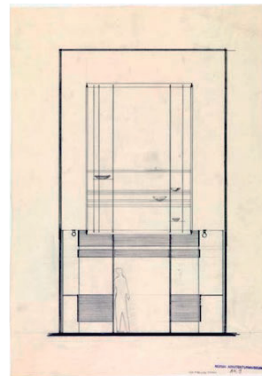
Section plan of the Triennale di Milano, Milano, Italy.
